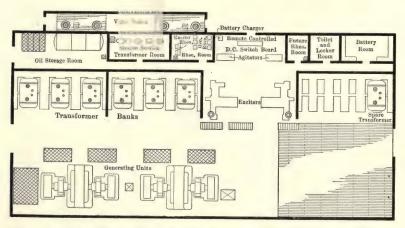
Floor Plan of Big Creek Power-house. Pacific Light and Power Company. (For cross-section see Fig. 94.)
